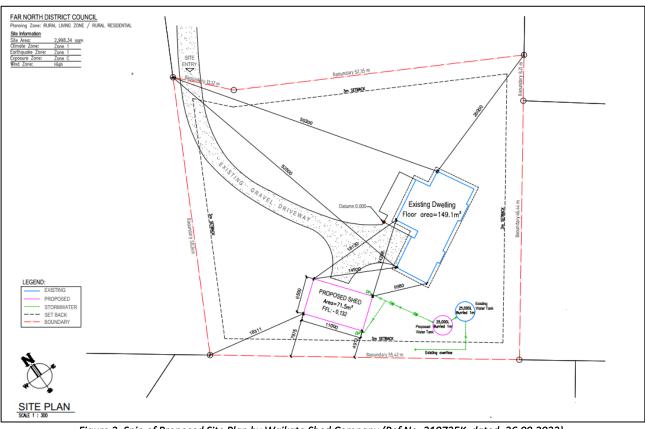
Snip of Proposed Site Plan by Waikato Shed Company (Ref No: 310735K, dated: 26.09.2023)
